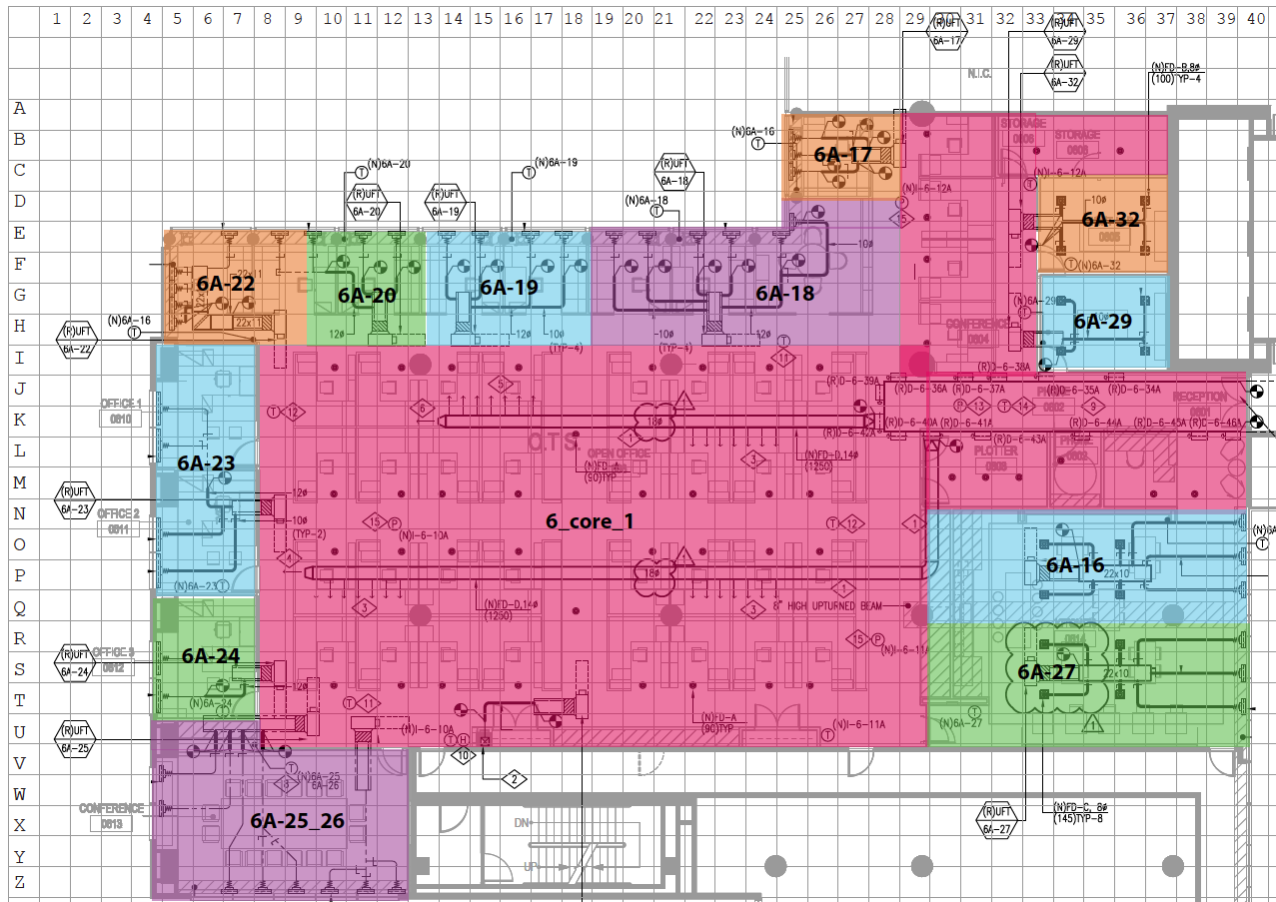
Zoning and grid plan for 6th floor of WSPFK offices
